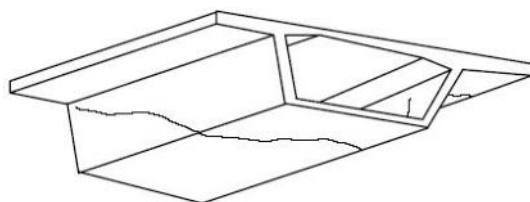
Box Girder Cracks Induced by Torsion and Shear
